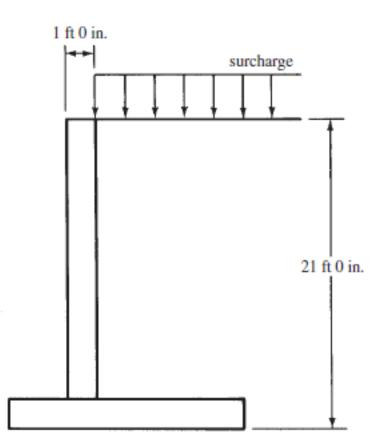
Cantilever retaining wall for Example 13.2.
